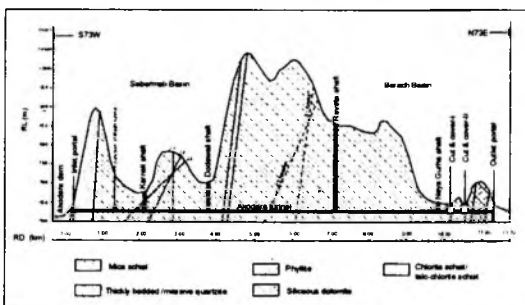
Longitudinal section of Akodara tunnel, Dewas-II project
